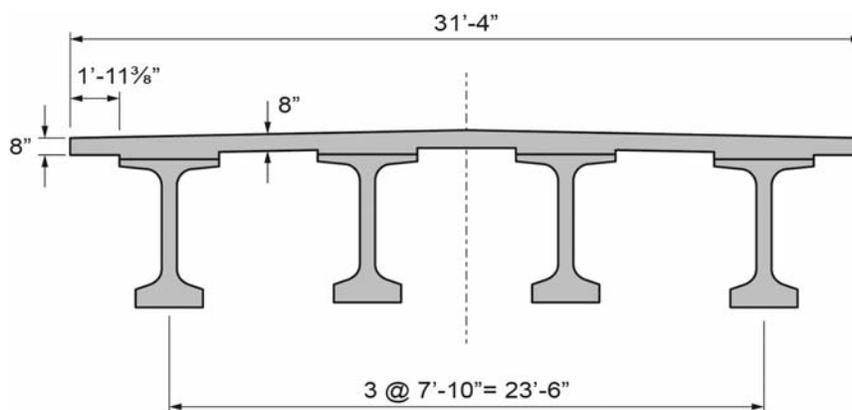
Cross Section for the 132'-6" Span Bridge using NEBT 1800 - Baseline
